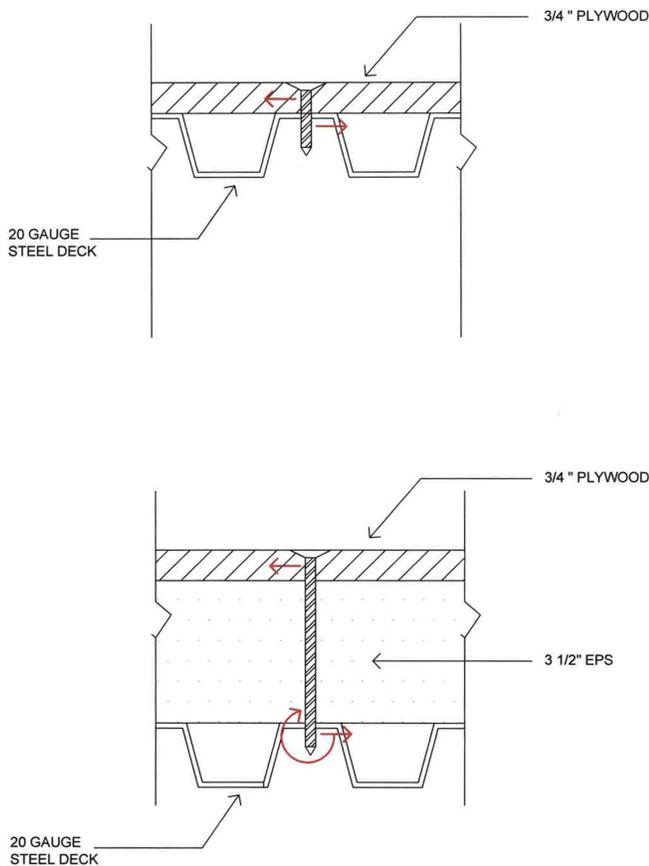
Top, manufacturer's recommended installation with the exterior sheathing fastened directly to the steel structure. Bottom, the assembly used at the subject facility. The thick layer of EPS required much longer fasteners.
